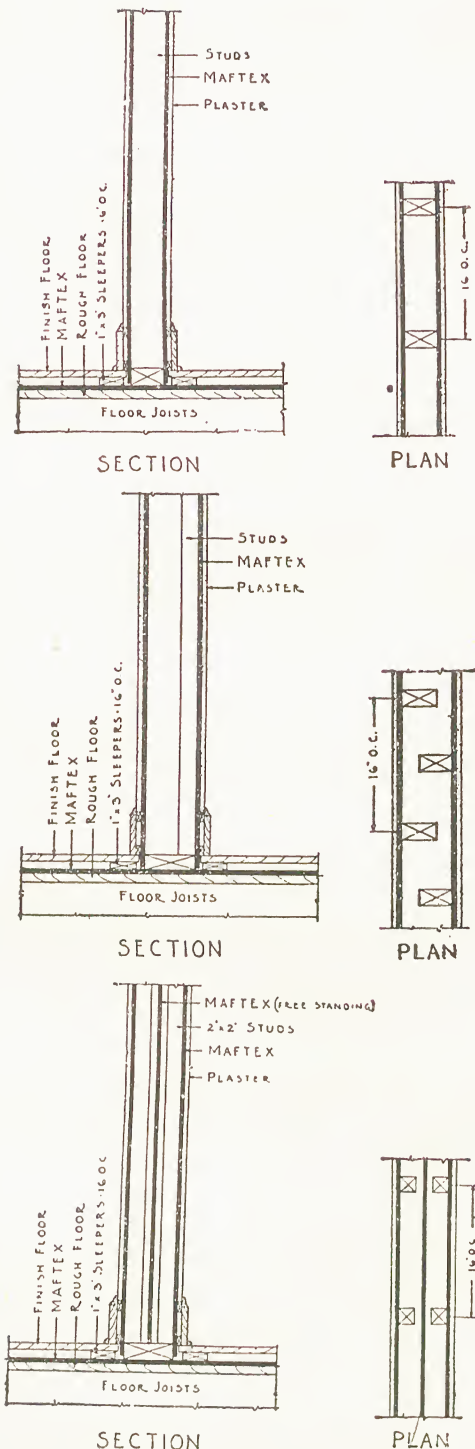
Soundproofing partitions with "Maftex" wall-board.
